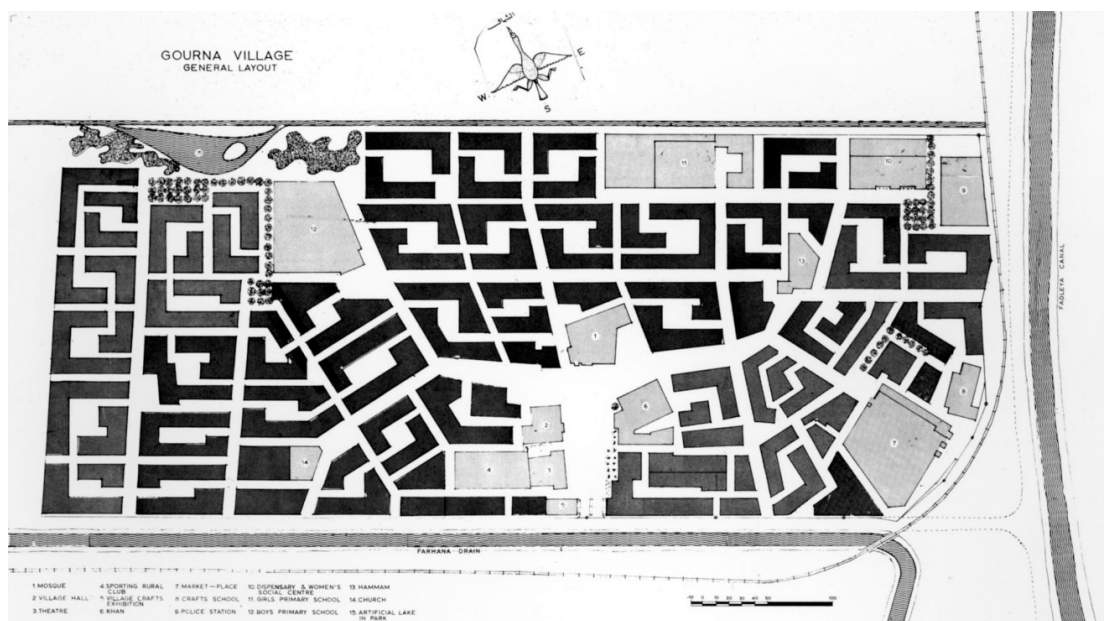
General layout of New Gournia Village, Luxor, Egypt (Fathy, 1973).
